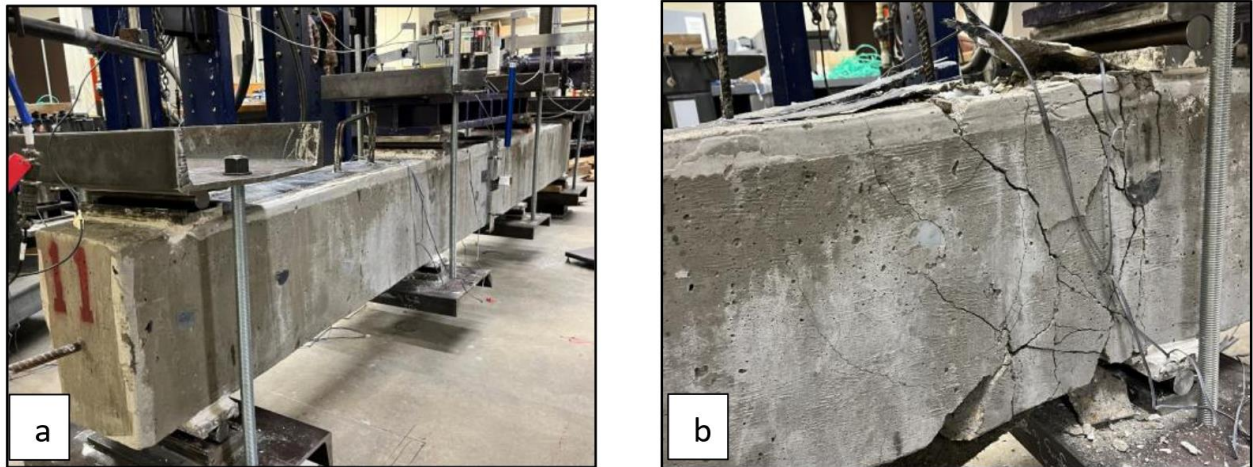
Specimen No.11. (a) before testing. (b) at failure
